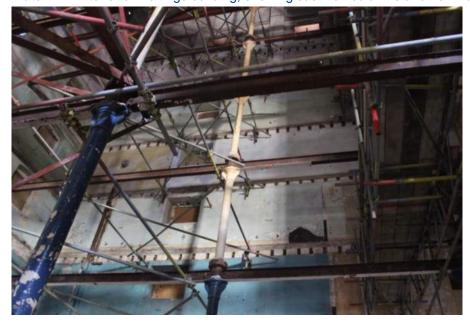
Interior of Maltings building, showing cast iron columns and iron I-beams (2017)
